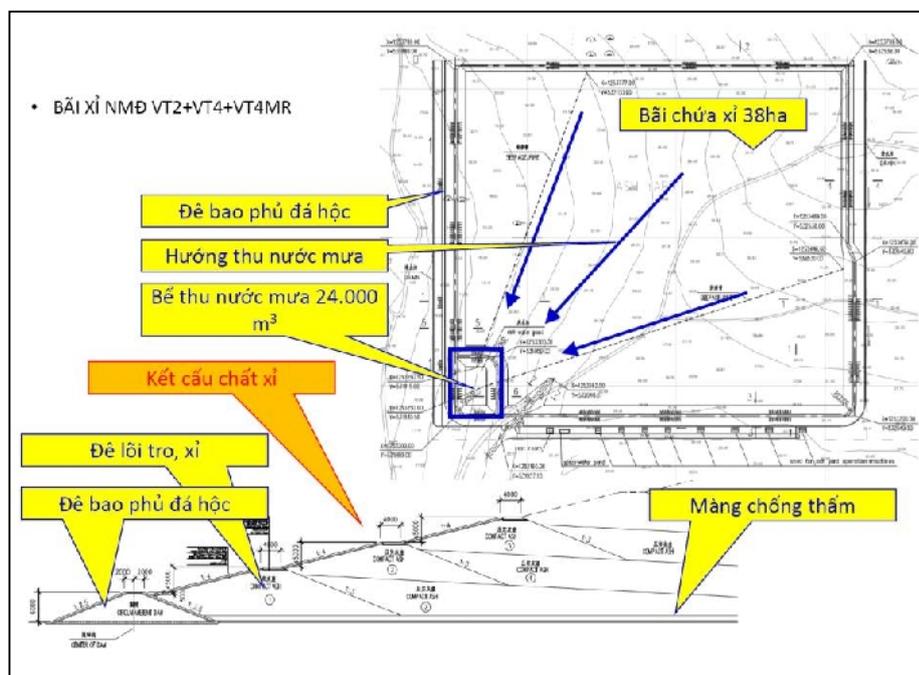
The collecting direction of rainwater in the ash pond of VT2,VT4 & VT4 Extension
